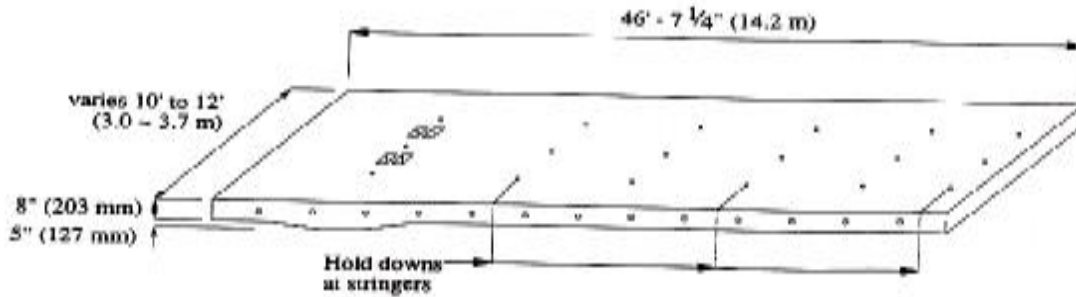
Typical precast concrete panel of the Woodrow Wilson Memorial Bridge
